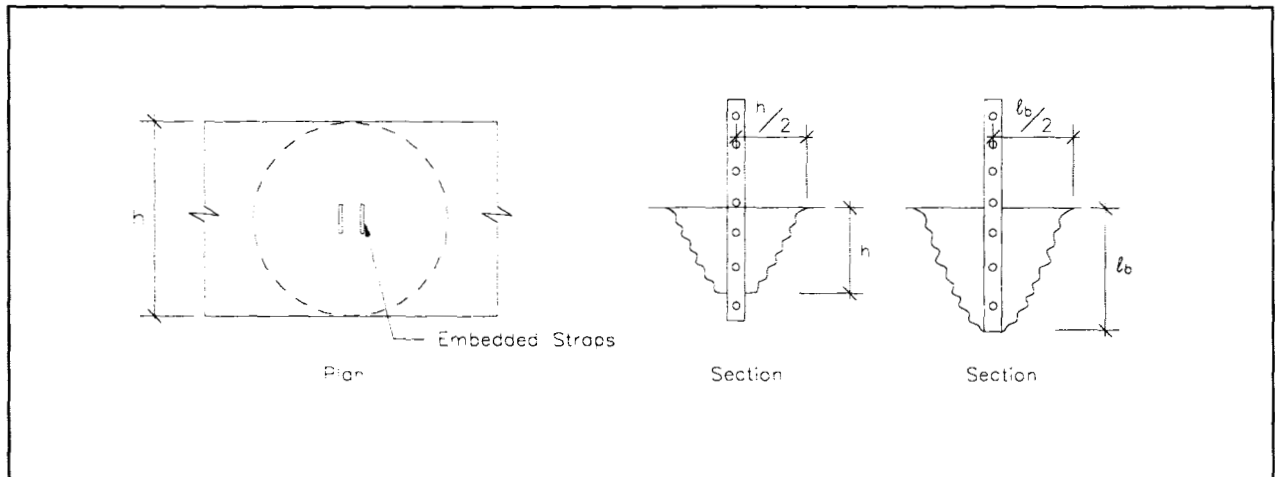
Assumed Cone Shear Failure Surface for Strap Connection
